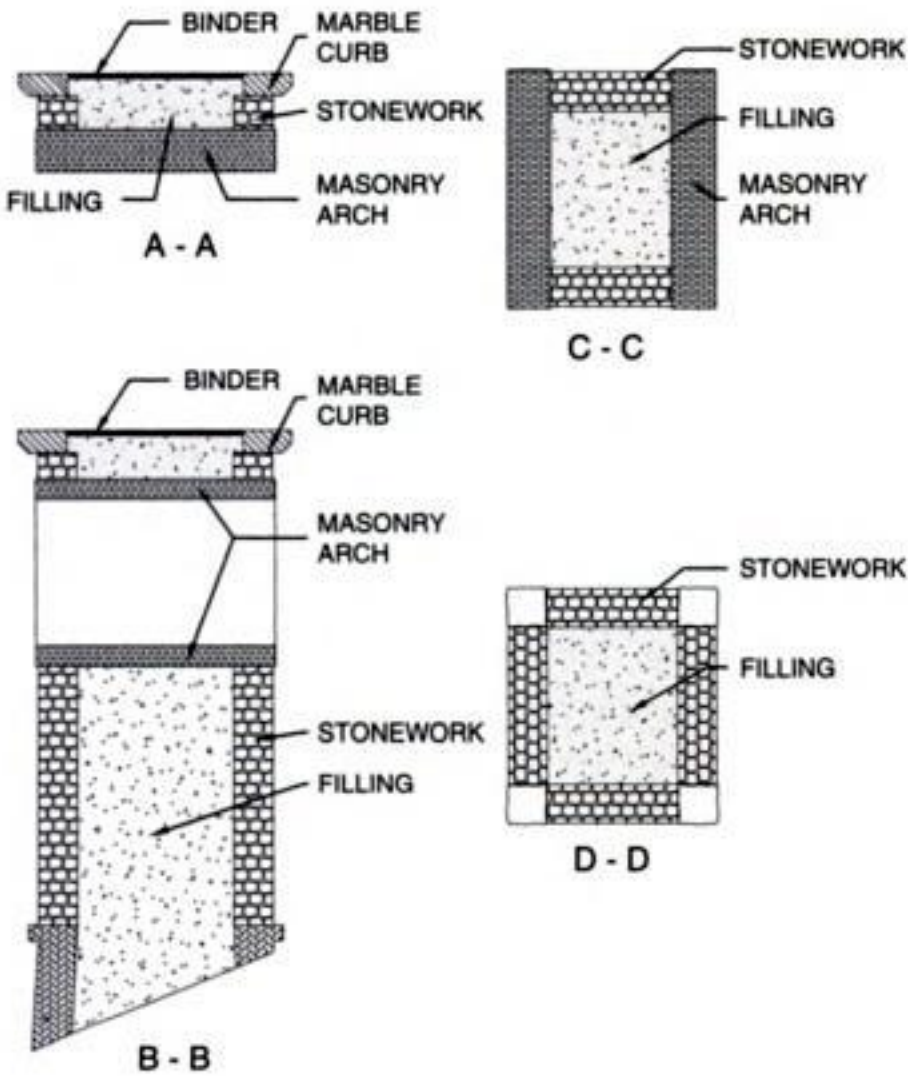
Typical cross-sections; Viaduct of *Canal Piccinino*.
